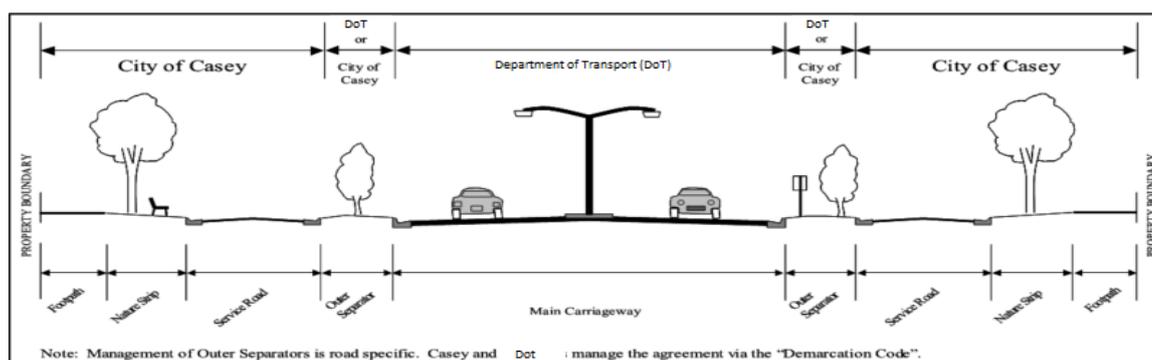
Cross section showing responsibilities on typical primary arterial Road
